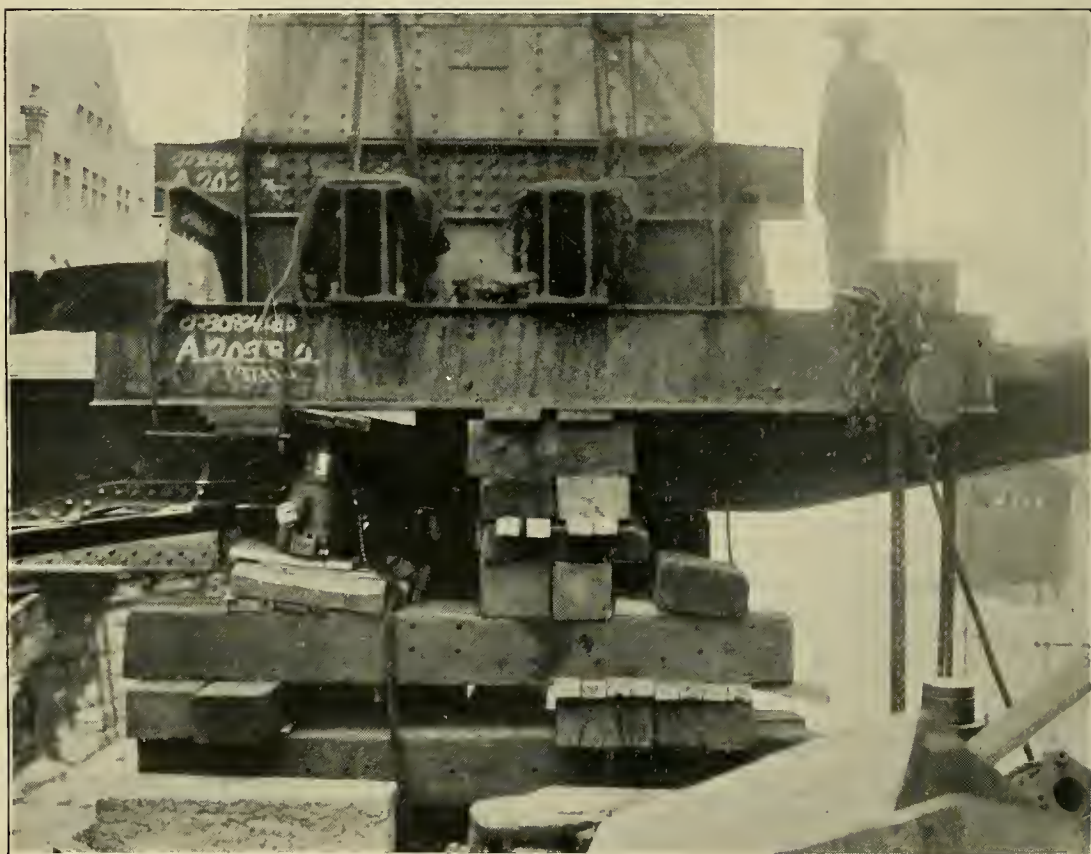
JACKING TRUSSES INTO POSITION LATERALLY AFTER RAISING BRIDGE.
